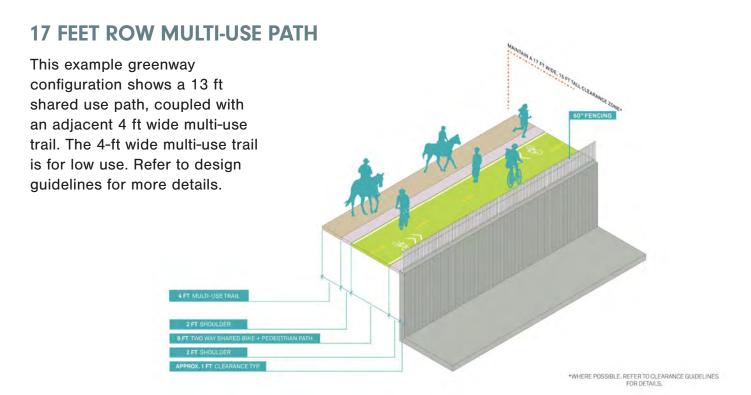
17-ft wide greenway cross section example from Table 5-1
